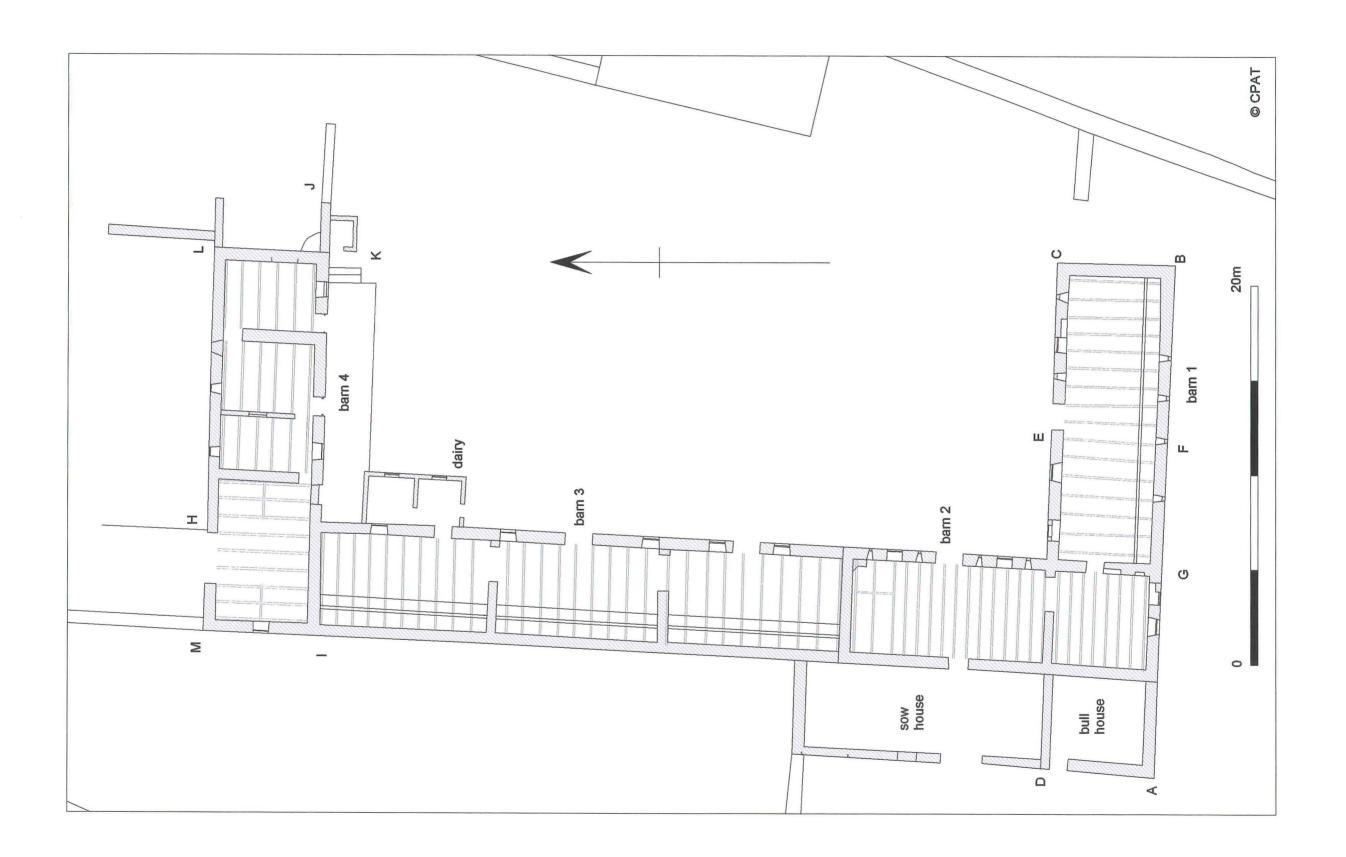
Roundhouse Farm barn complex, ground floor plan
